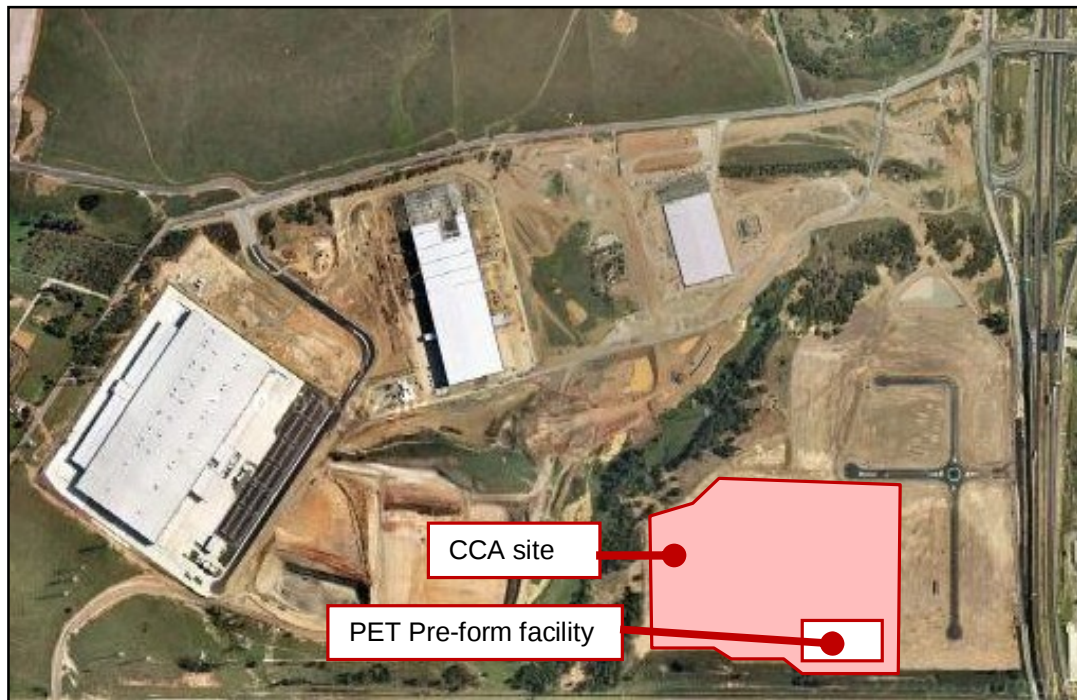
Site Plan with PET pre-form facility in relation to other buildings.
